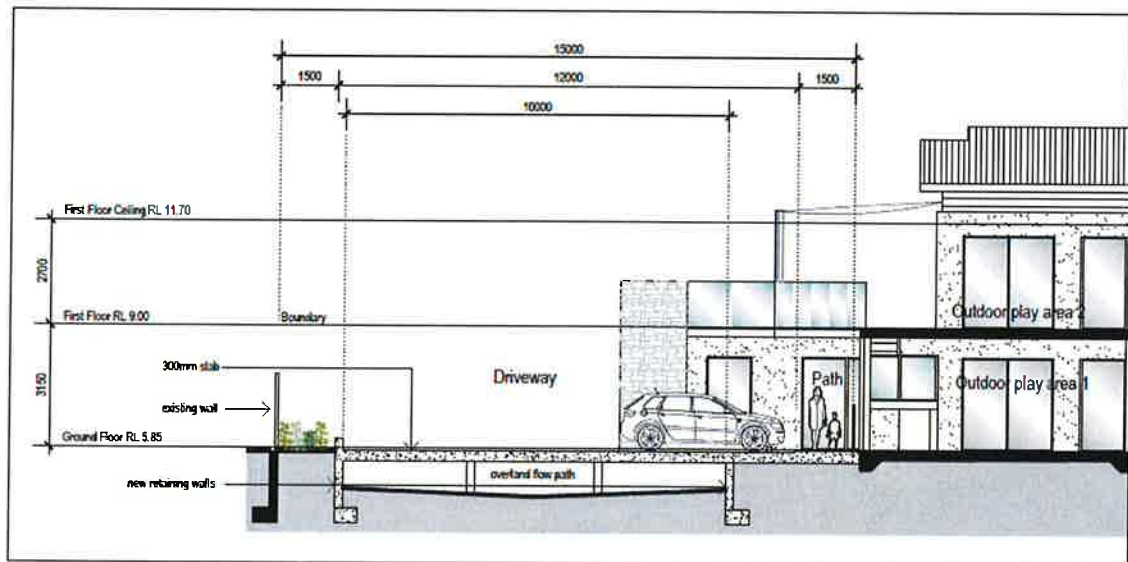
Proposed car parking area to be constructed over overland flow path (Source: Proponent's additional information)
